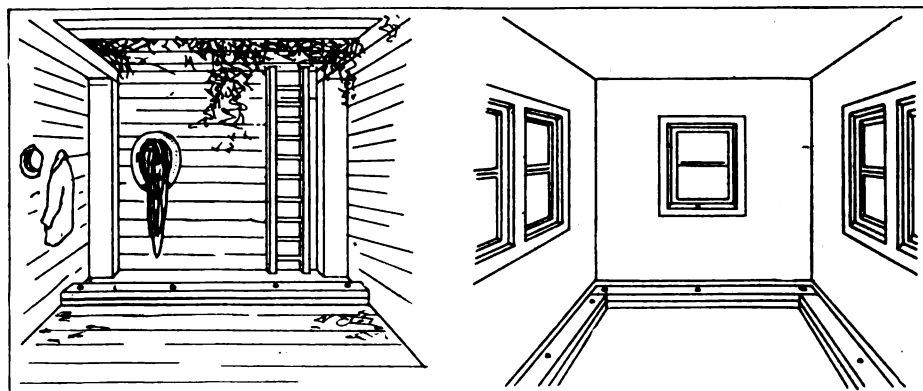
Joists Prevent Car Being Backed Into Wall (Left), Joist Guides Prevent Car Contacting with Side or Rear Walls of Garage (Right).
